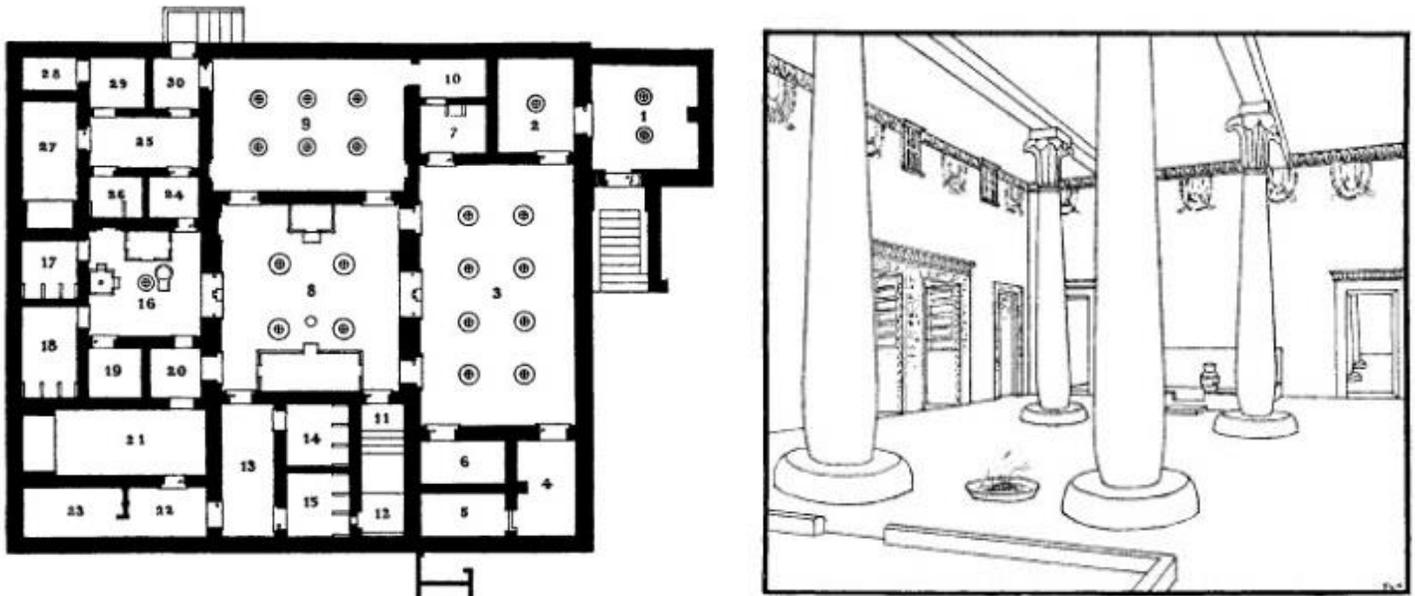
Plan & reconstruction of the house of Vizier Nakht K.50.1 [39].
